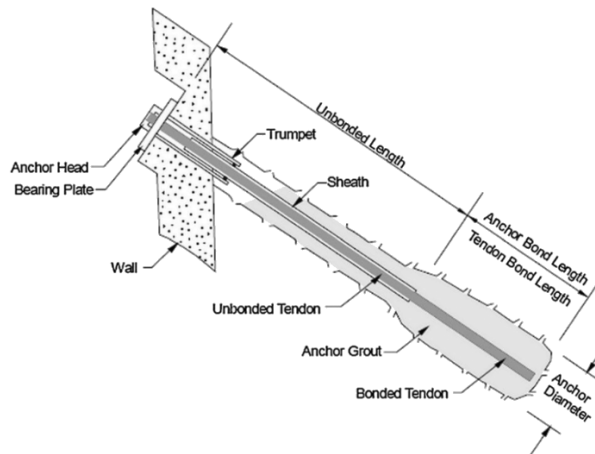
Schematic drawing of a grout anchor (Özhan and Guler, 2017)
